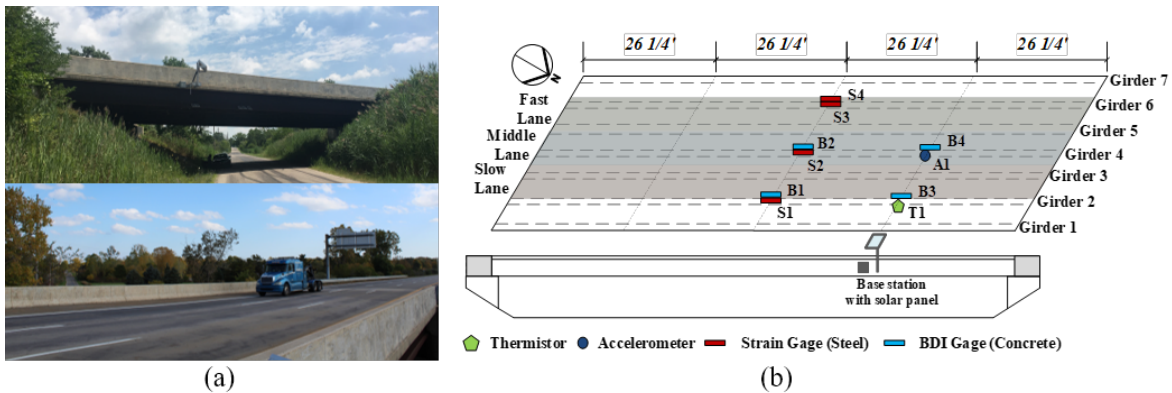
(a) Views of the Newburg Road Bridge; (b) instrumentation design of the Newburg Road Bridge monitoring system.
